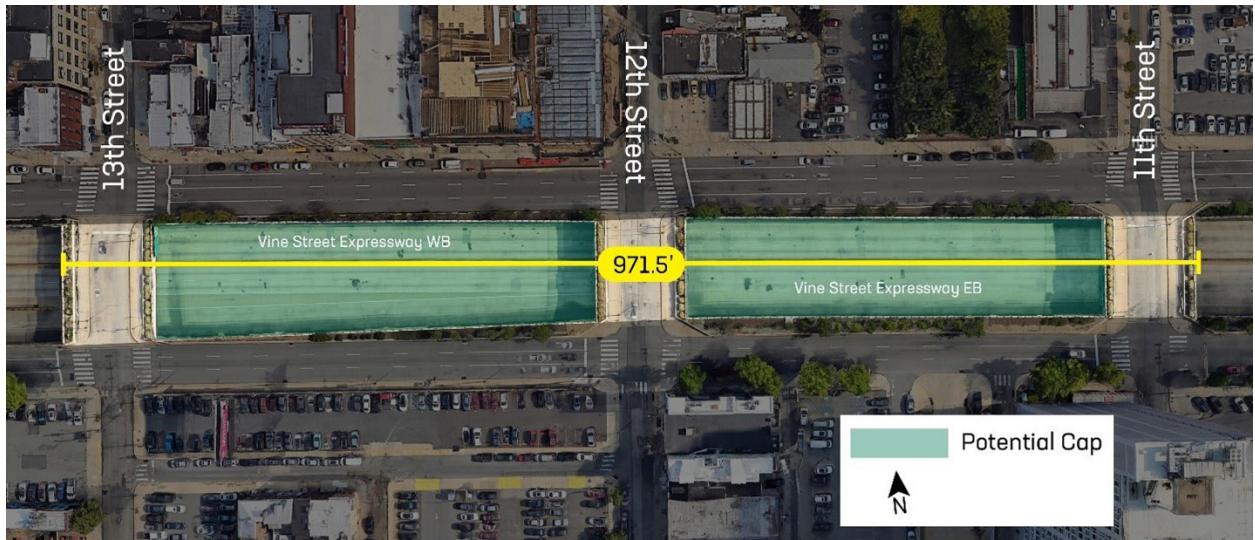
Measurements from 11th Street Bridge to 13th Street Bridge
